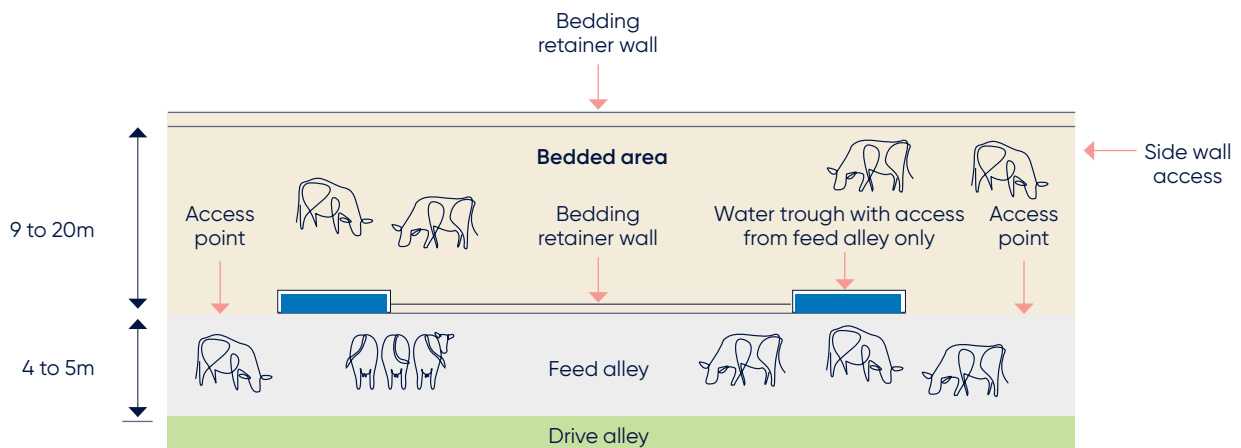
Concrete retaining walls provide separation between the feed alley and the bedded pack area which is helpful in managing pack moisture
